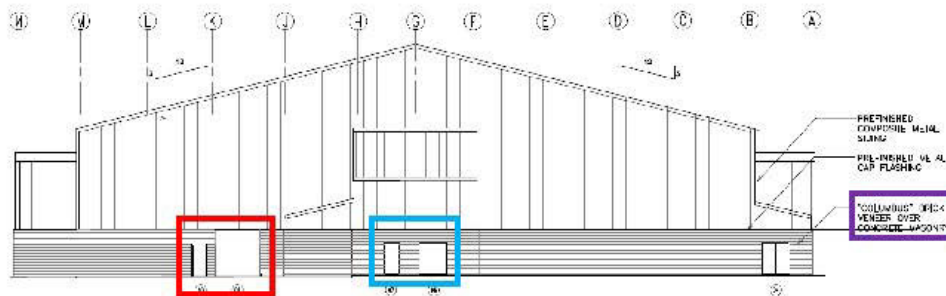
Image showing the proposed configuration of the southeast elevation. All of the pedestrian doors would be single and double leaf with steel components, similar to those located on the current building. One vertical roll-top door and one single-leaf door would be installed left of the nose dock (indicated in red), and two new doors would be installed in the nose dock (indicated in blue). The drawing note indicated in purple, which is shown on the 35 percent design plans, indicated that brick veneer would be installed; however, that design element has been removed to avoid impacts to the historic property.
